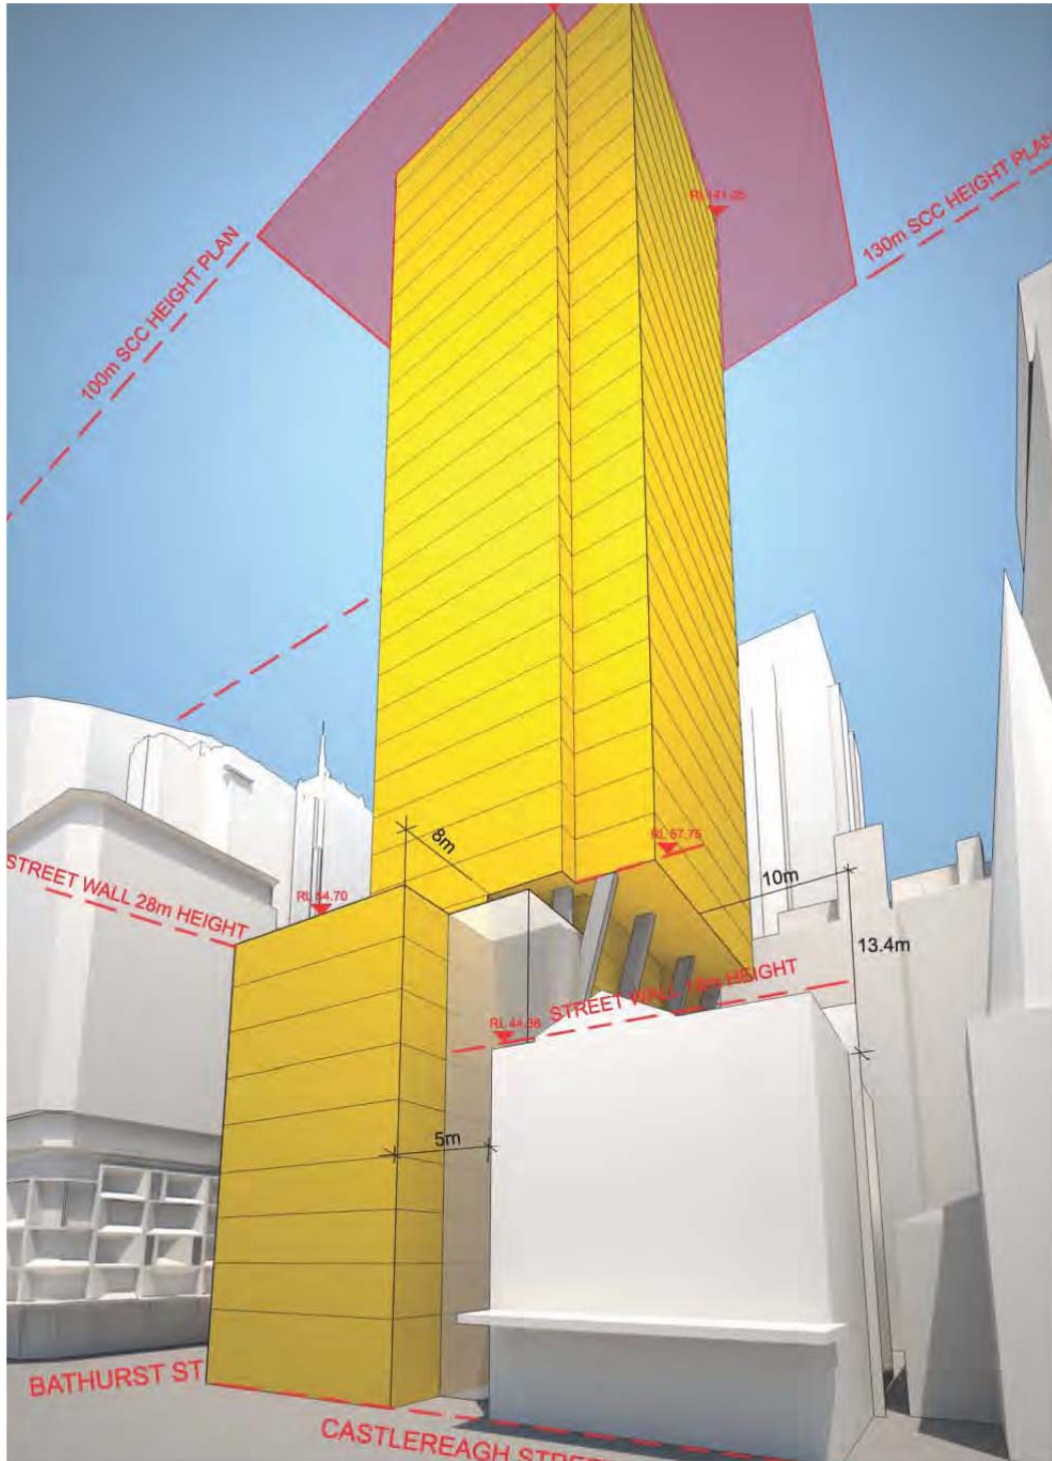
Proposed building envelope, viewed from along Castlereagh Street (retained Porter House right).
